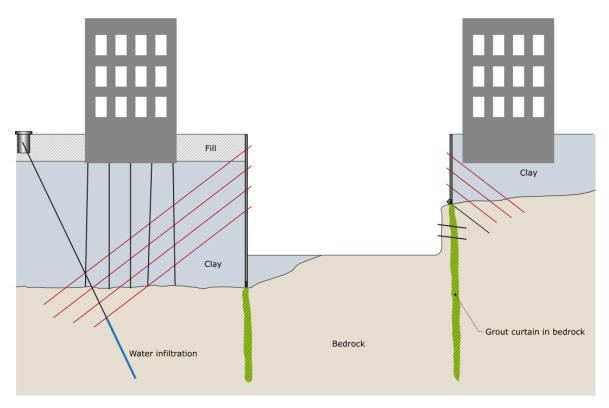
Grout curtain below sheet pile walls to seal against drainage to the excavation from fractures in the bedrock (NGF, 2019, figure modified to English).
